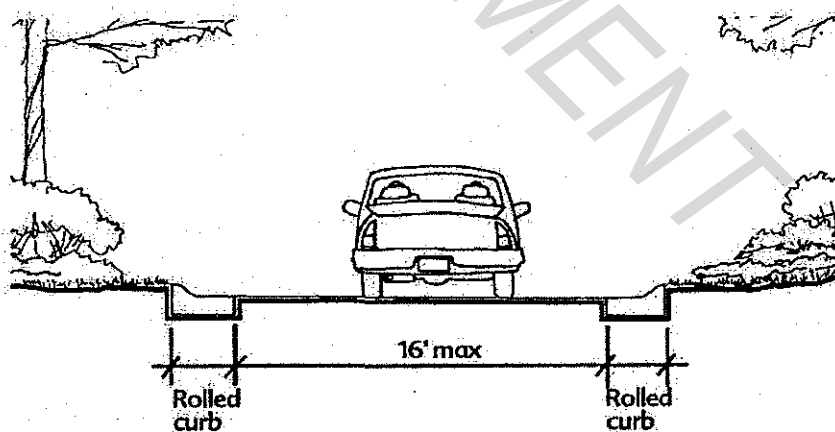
16-foot one-way roadway section (for one-way roadway loops)
